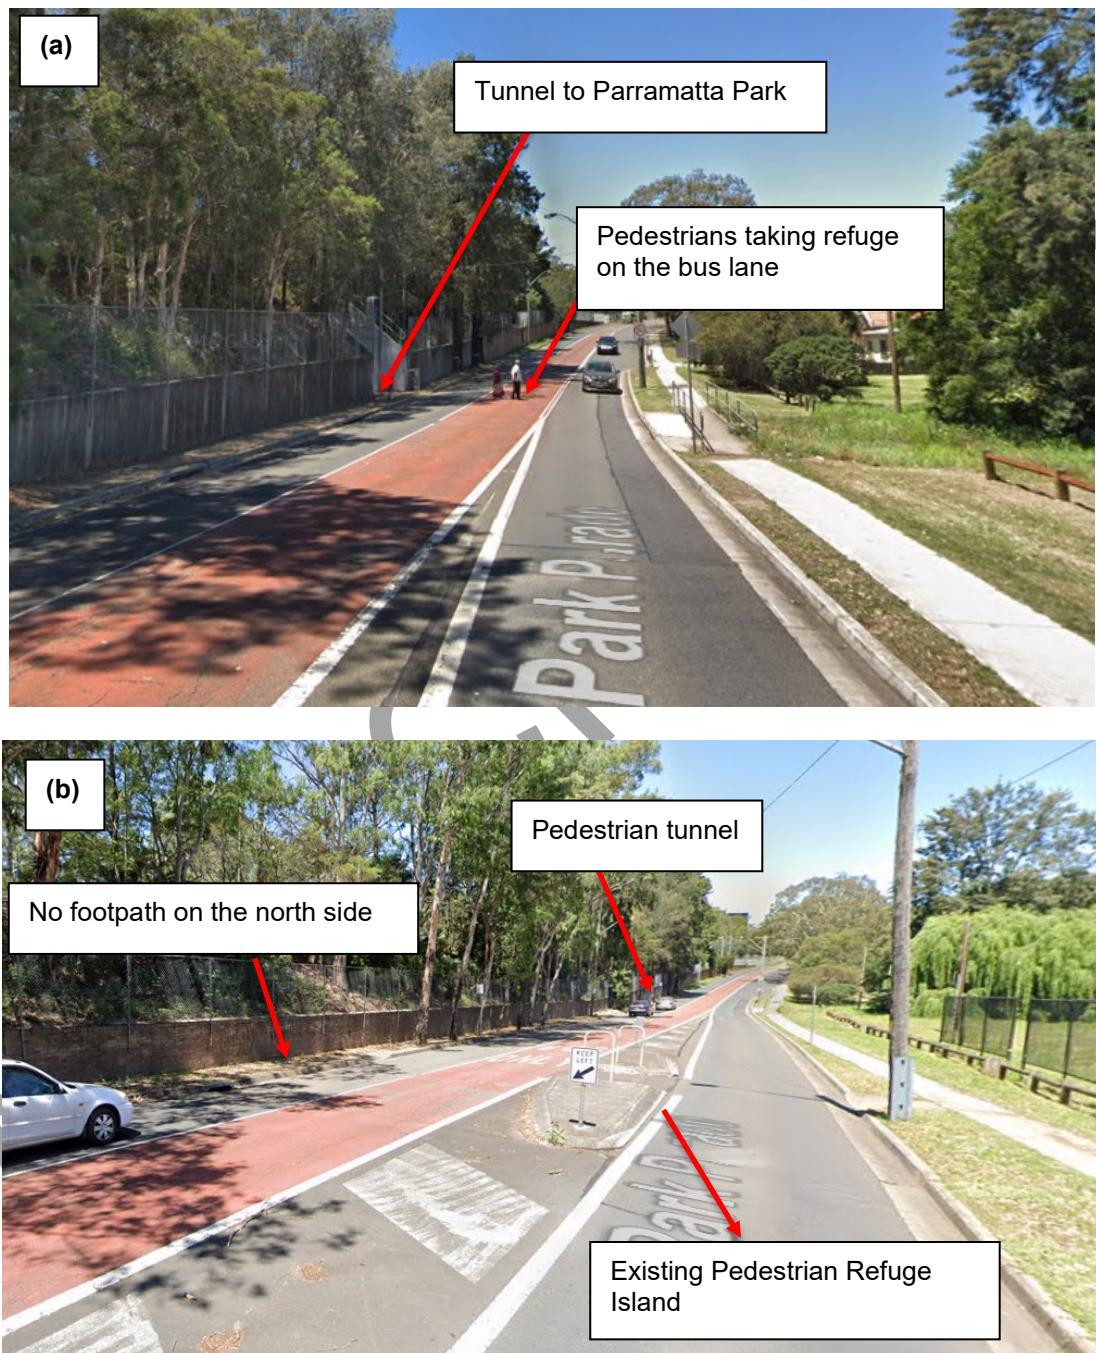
Street view of Park Parade, Parramatta looking eastbound (a) near the tunnel to Parramatta Park and (b) near the existing pedestrian refuge island
